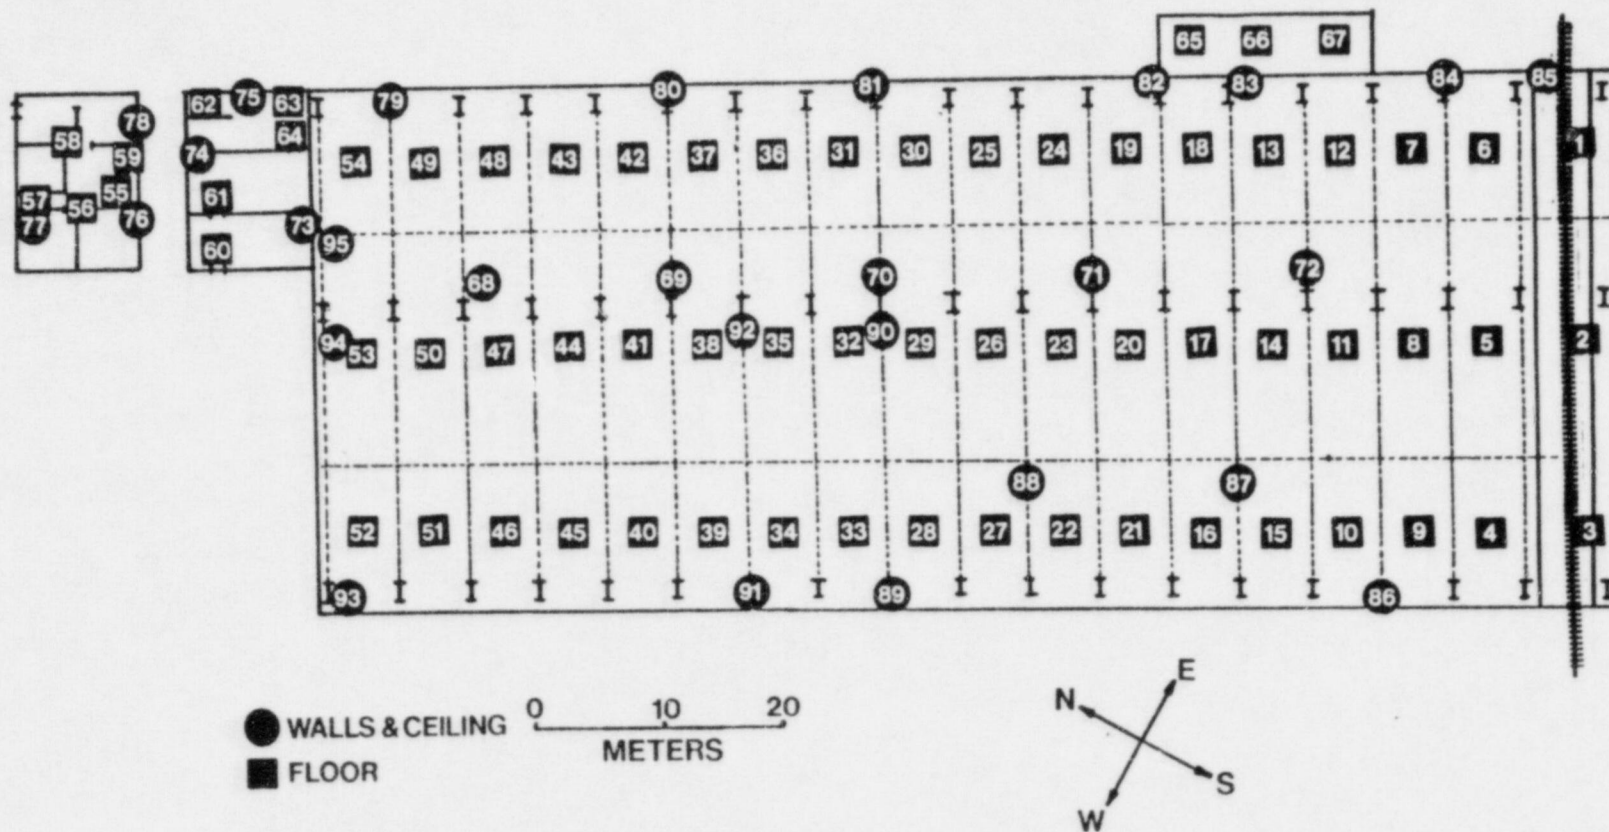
Floor Plan of the New Melt Shop Indicating Locations of Measurements and Smears
